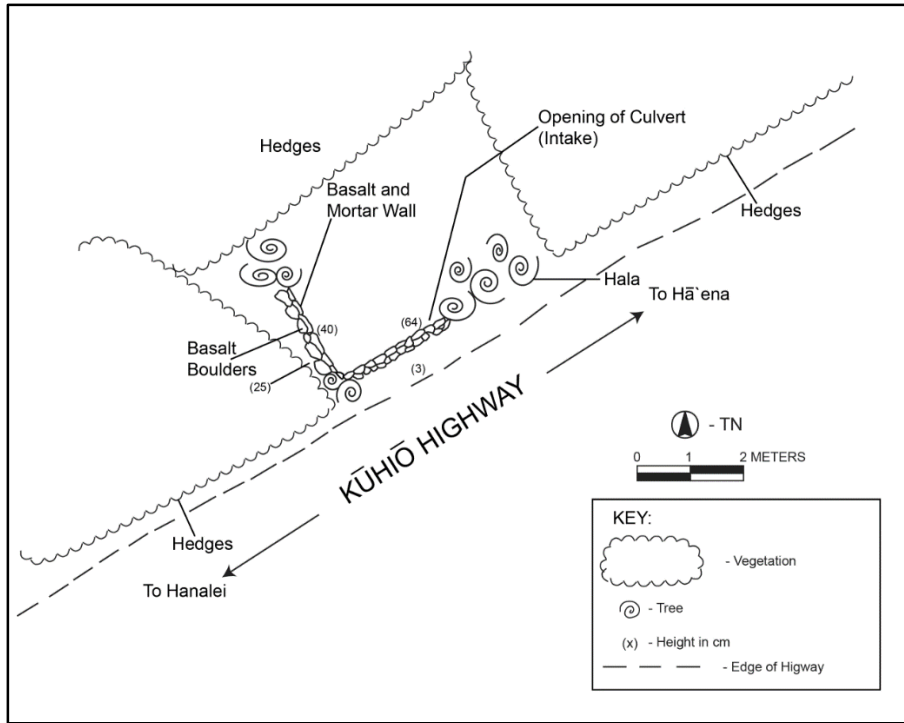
SIHP # 50-30-02-2299, illustrated plan view of intake culvert
